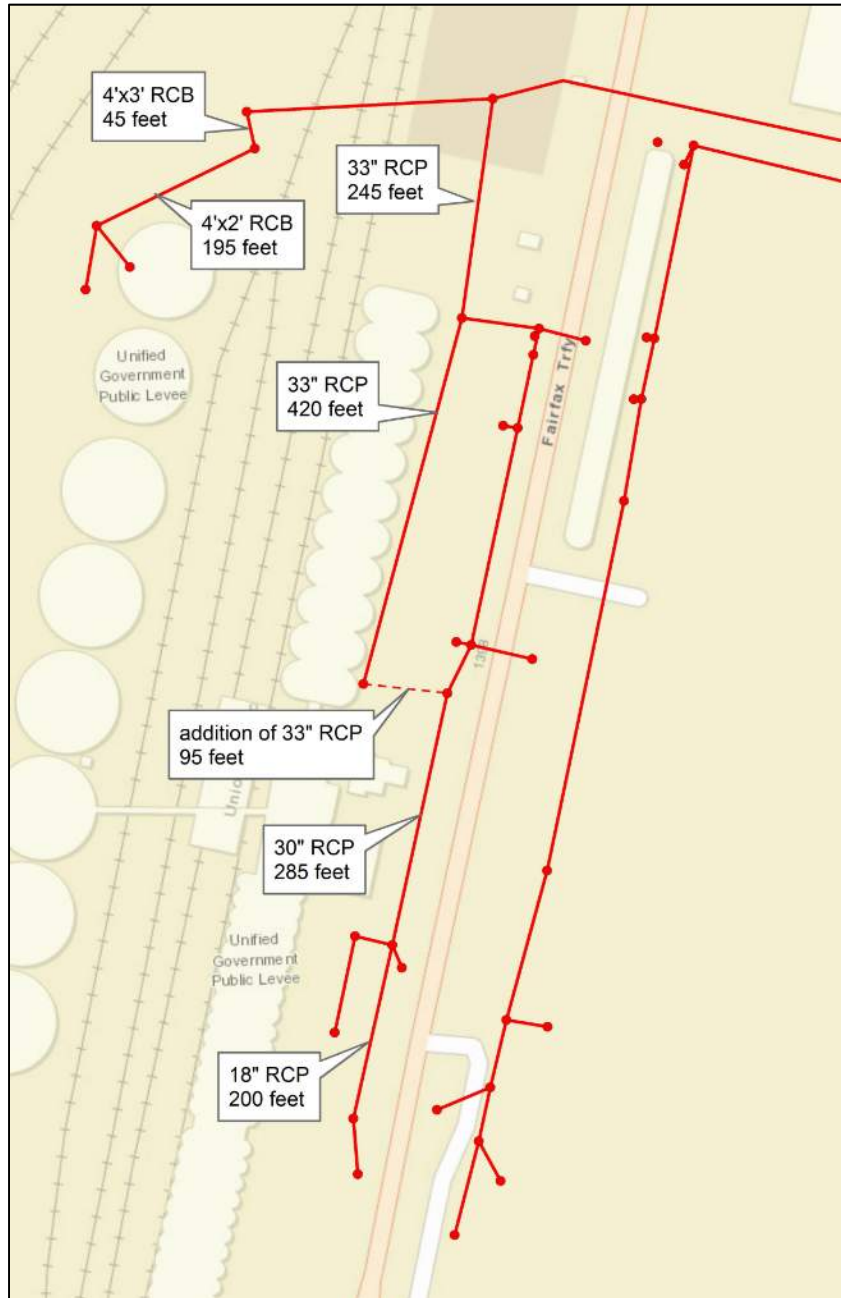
JERS-1 Proposed Stormwater Network Upsizing for 5-Year Event.
